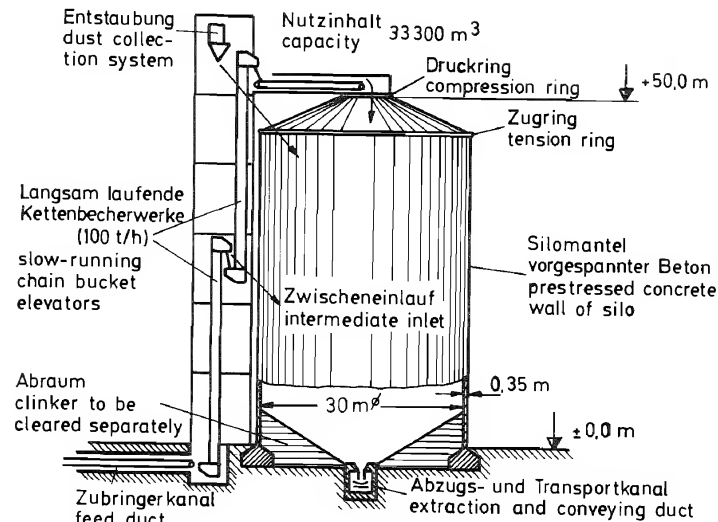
Silo constructed of prestressed concrete for 50000 t of clinker (from Funke, 1968)
